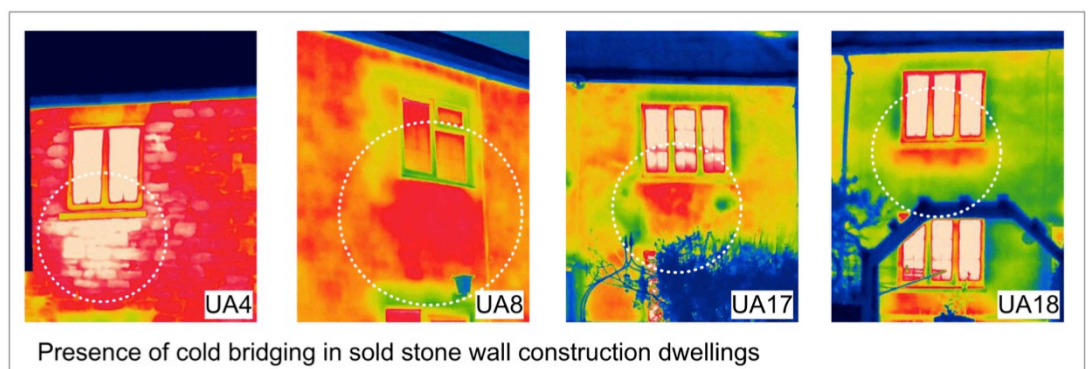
Common cold bridging heat loss between stone construction dwellings.
